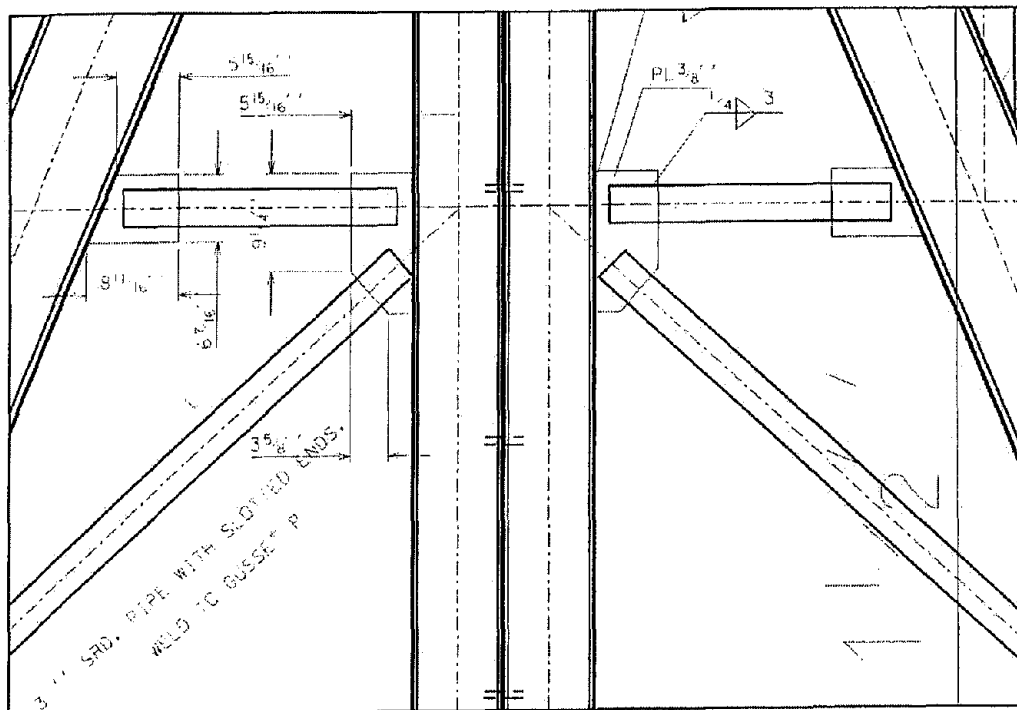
Construction drawing of load frame: Additional "A-Frame" detail (1"=25.4 mm)
